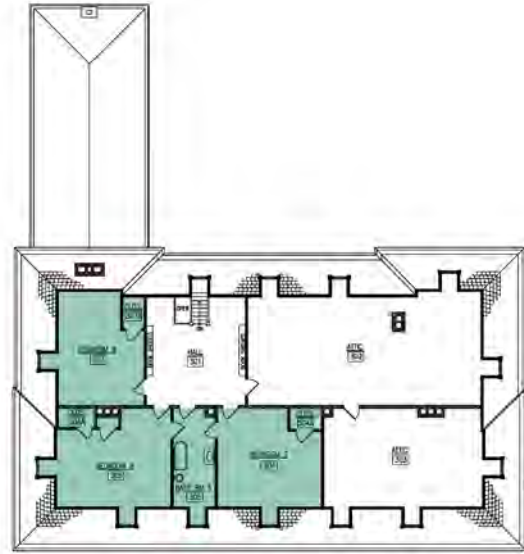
Third floor plan showing location of private spaces. (HA, 2015)
